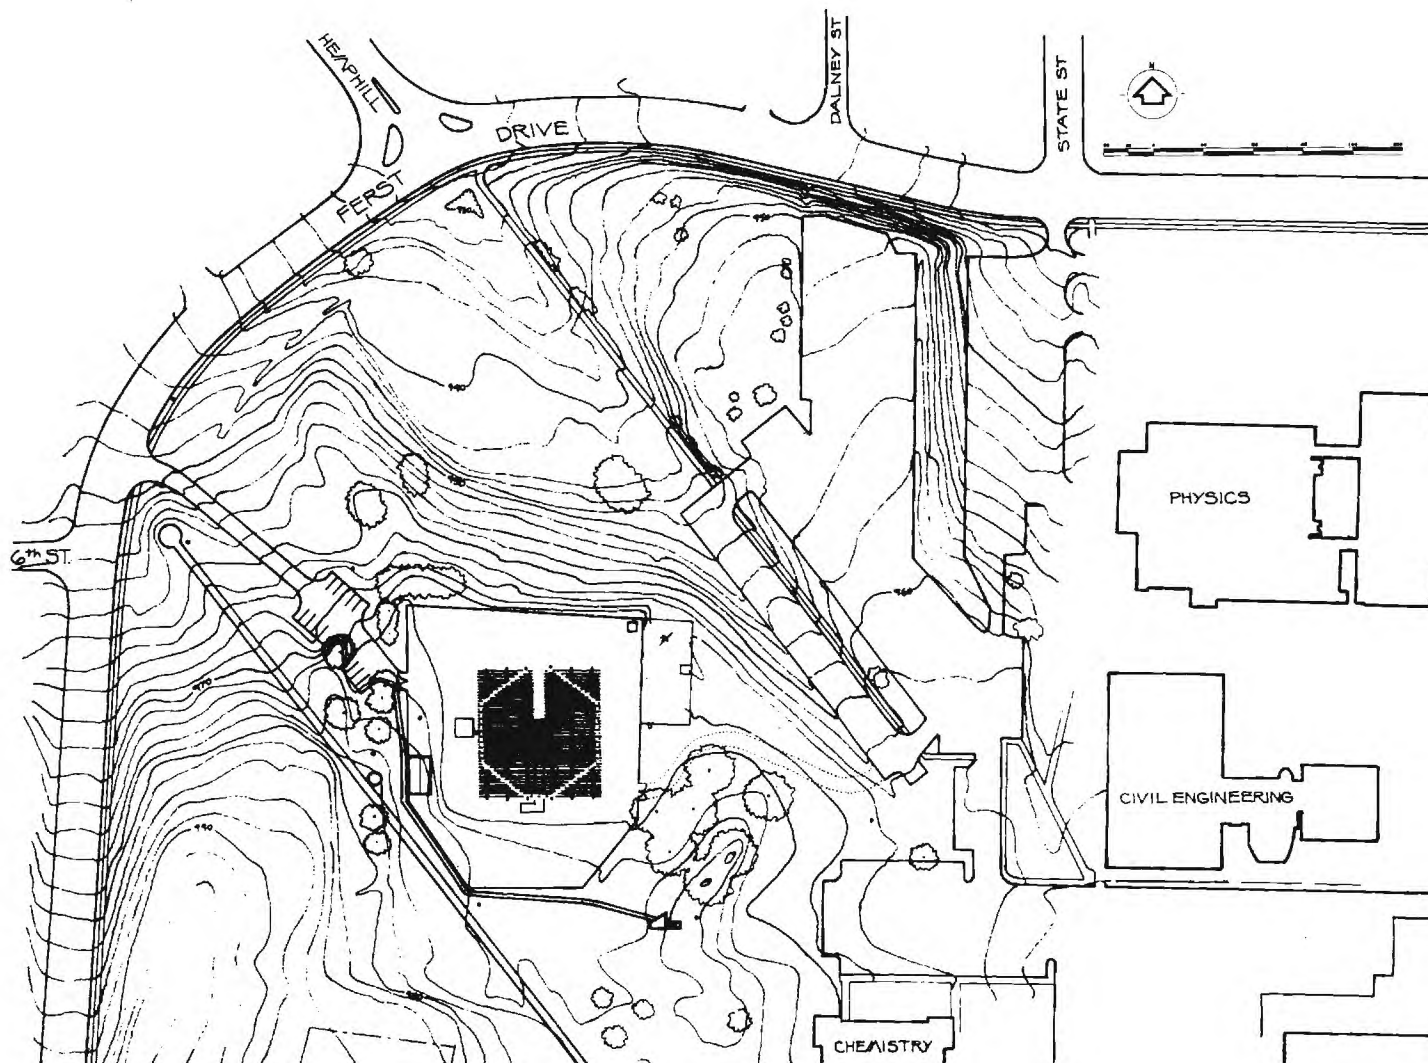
Campus Layout of Georgia Tech Solar Thermal Test Facility, Wind Turbine Test Facility, and Civil Engineering Building Site
